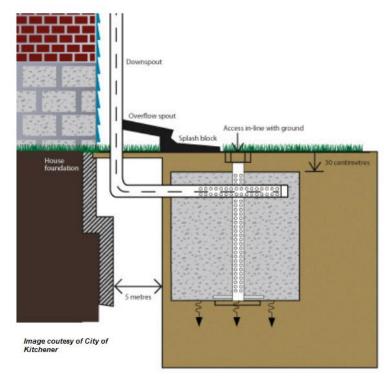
Cross section of Infiltration Gallery (City of Kitchener – Stormwater Credit Application, https://www.kitchener.ca/en/resourcesGeneral/Documents/DSD_ENG_stormwat er_credit_Application.pdf)
